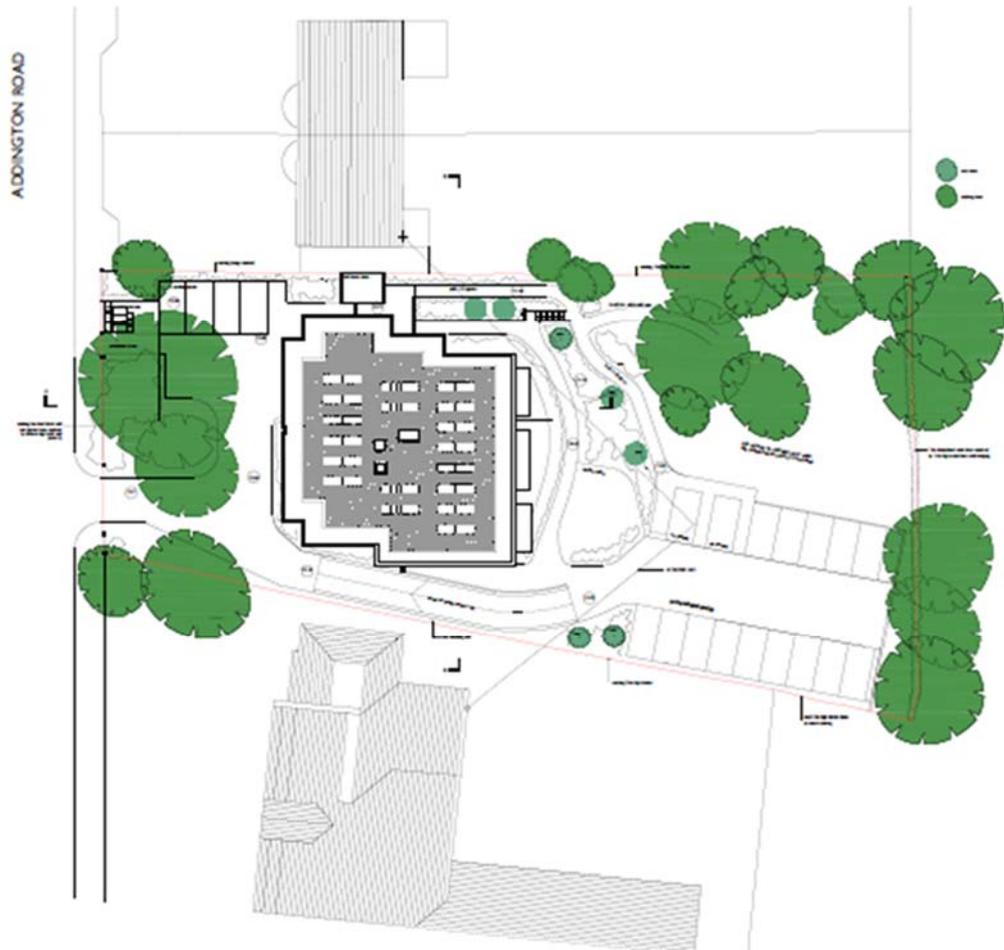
Proposed site layout showing proposed development in relation to adjacent sites
